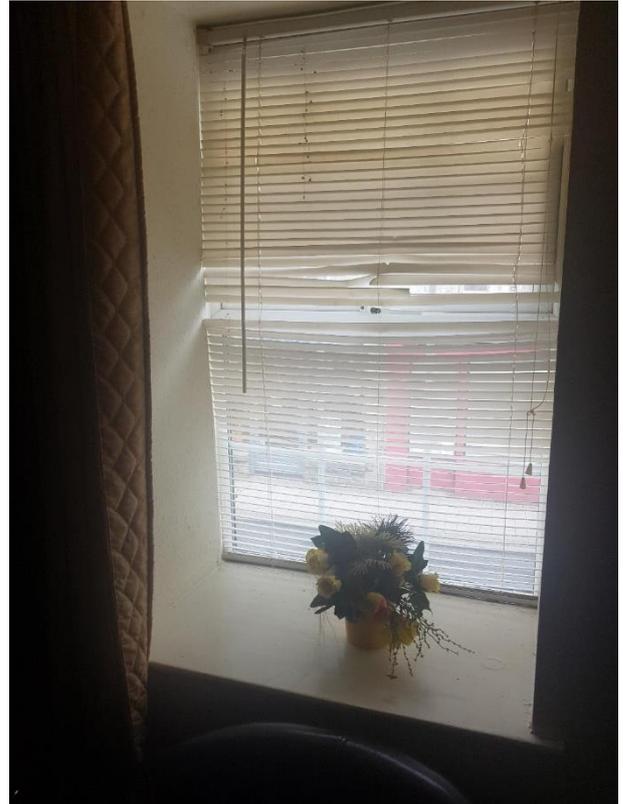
Hallway adjacent to entrance to 2nd floor apartment.
